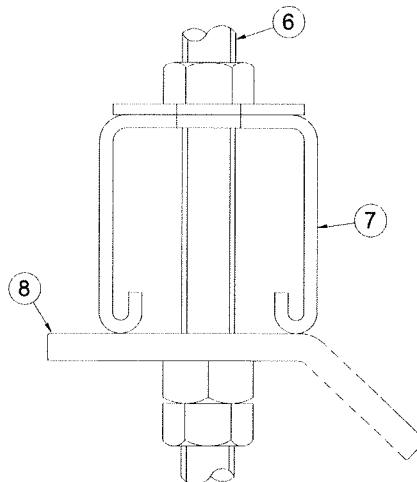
Typical Details of Horizontal Assembly Duct Jointing and Support
